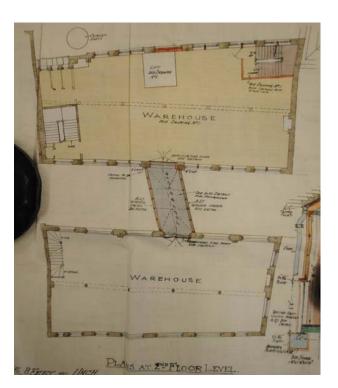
1916 plan showing linking bridge between 8-10 Hayne Street and 2 Hayne Street (Source – LMA, GLC/AR/BR/22/BA/043620)
